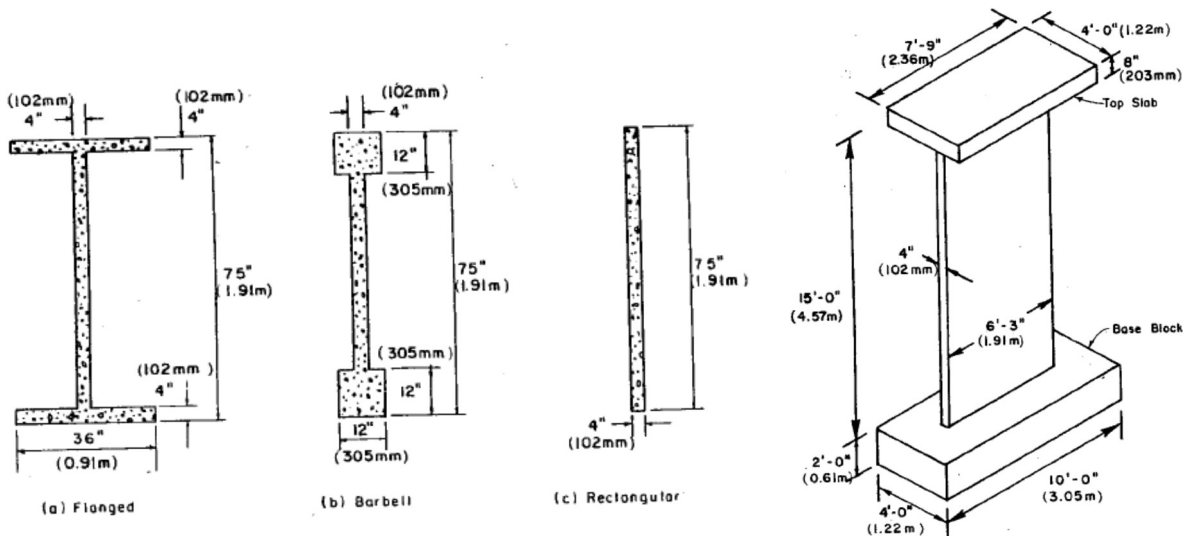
Typical details for walls tested by Oesterle et al (1976)
